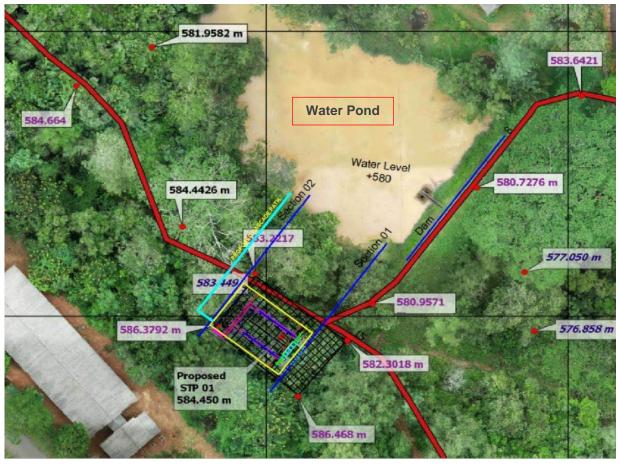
NATURAL WATER POND AND STP 1 LOCATION
